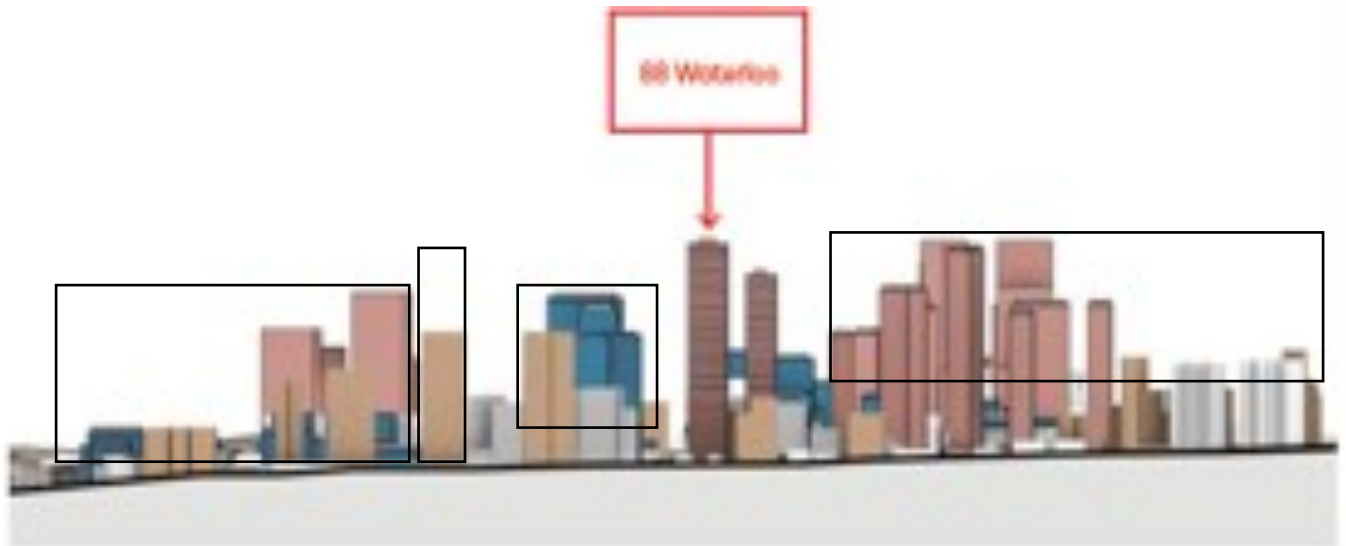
Section B (Herring Road View) Figure 74 Section B (Herring Road View) page 34 Urban design and architect's report Appendix E.
